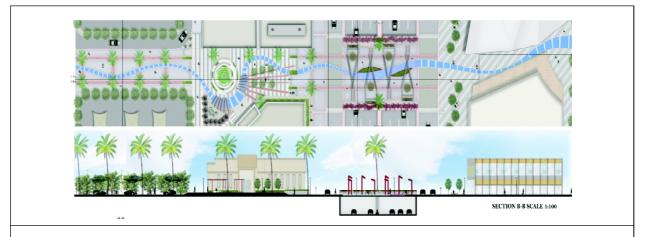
3rd Street Crossing Prince Turki Street At Ground Level Where Vehicular Circulation is Separated Using an Underground Tunnel
